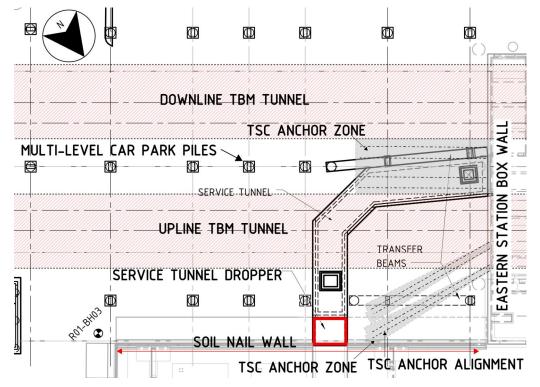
Plan view of soil nail wall and the vertical service tunnel dropper next to the car park.
